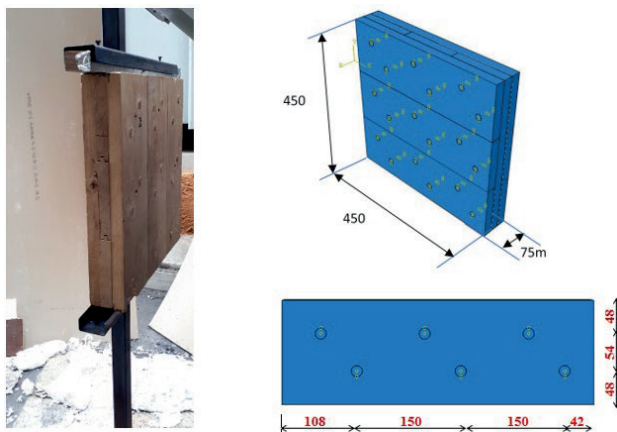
Adhesive-free CLT panel geometry and specimen dimensions
